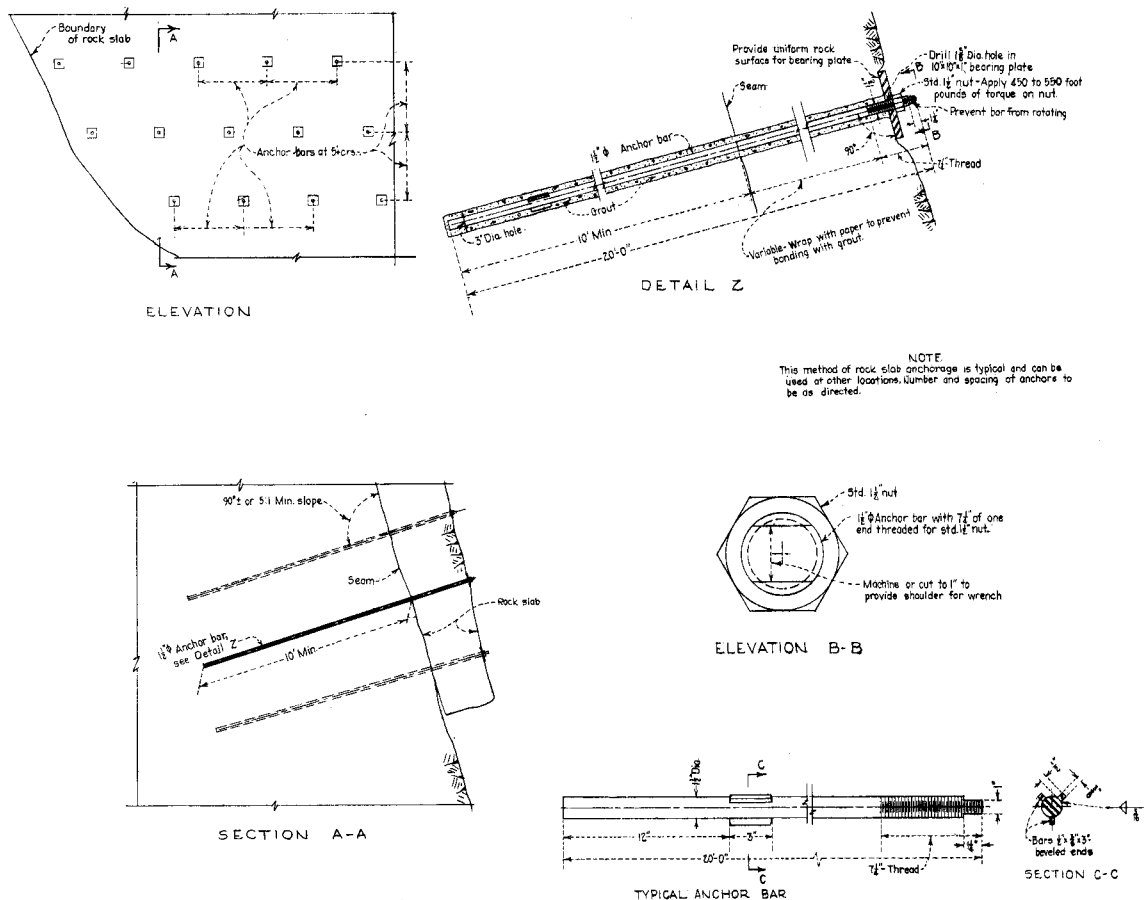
Left diversion tunnel—Rock slab anchorage downstream of outlet portal. From drawing No. 557-D-1505.
